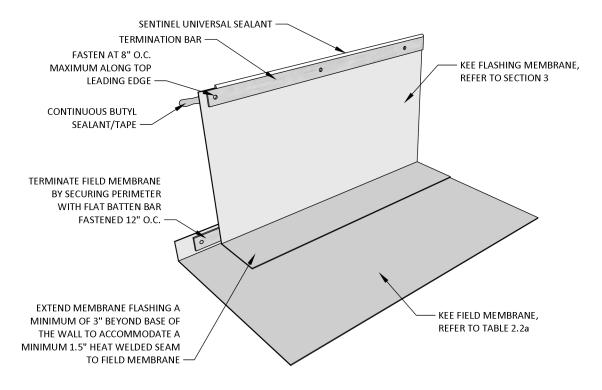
Mechanically Fastened KEE Field Membrane at Wall/Curb with Vertical Perimeter Fastening
